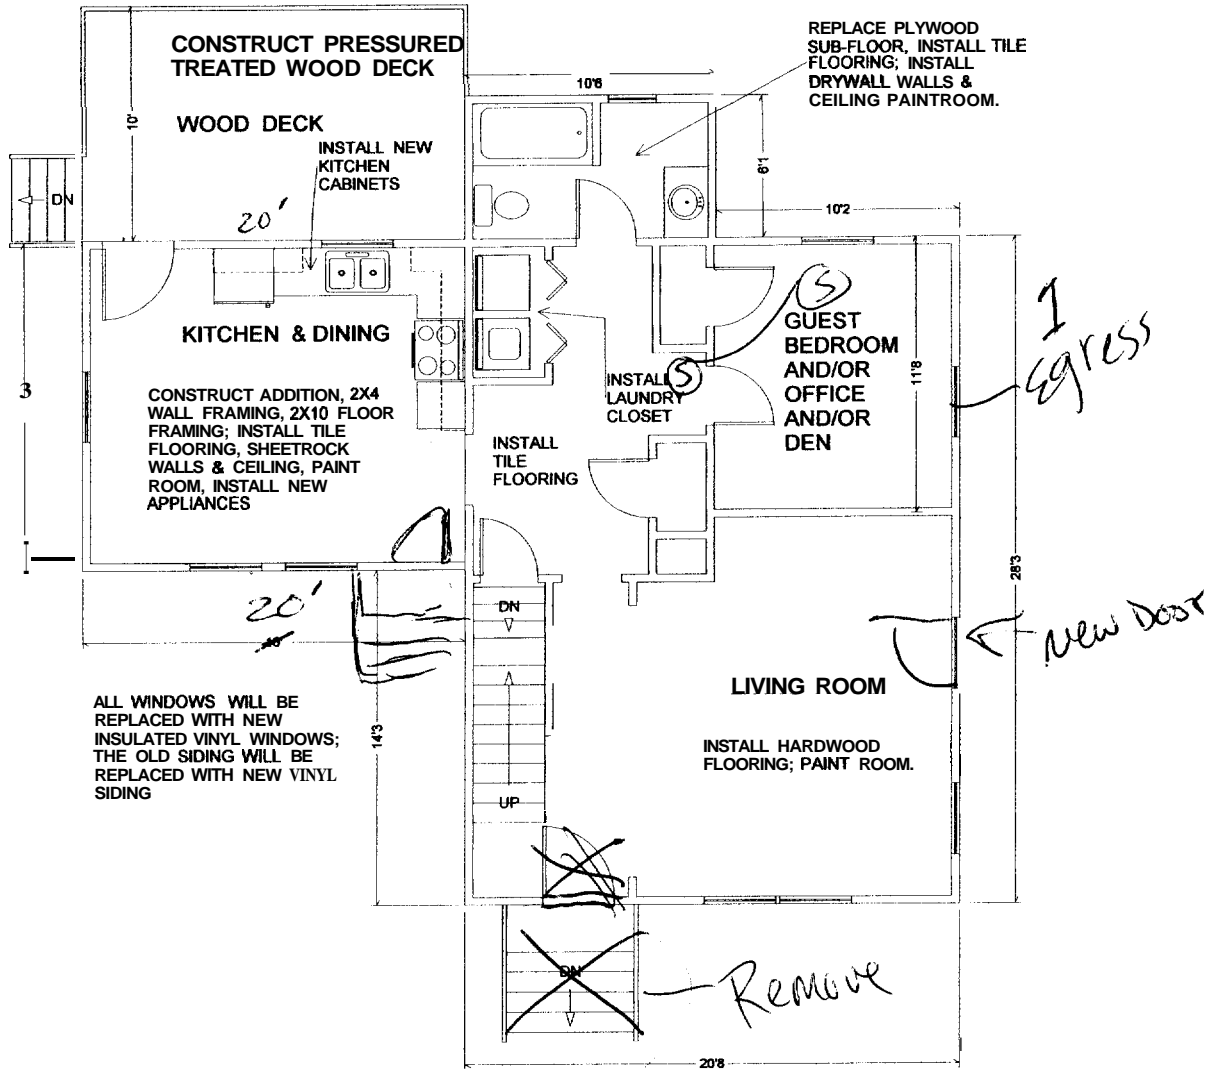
# EXHIBIT "B" SECOND FLOOR PLAN "AS IS"
